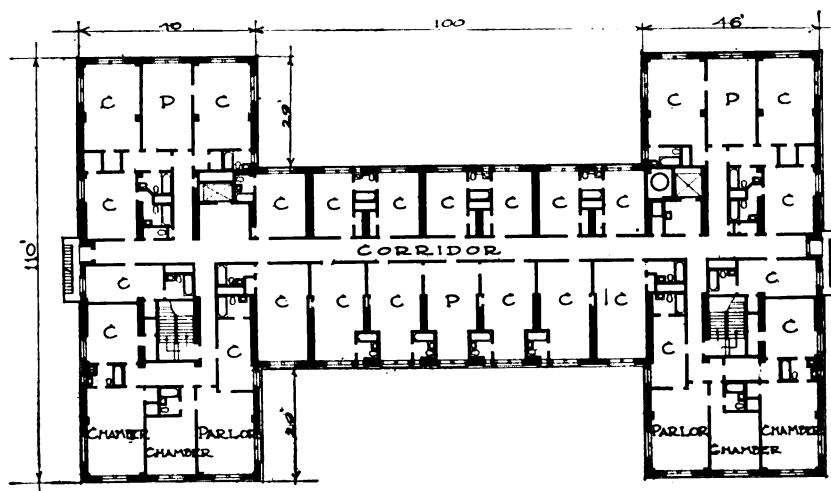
PLAN OF SECOND FLOOR—SOUTH SHORE COUNTRY CLUB, CHICAGO.
